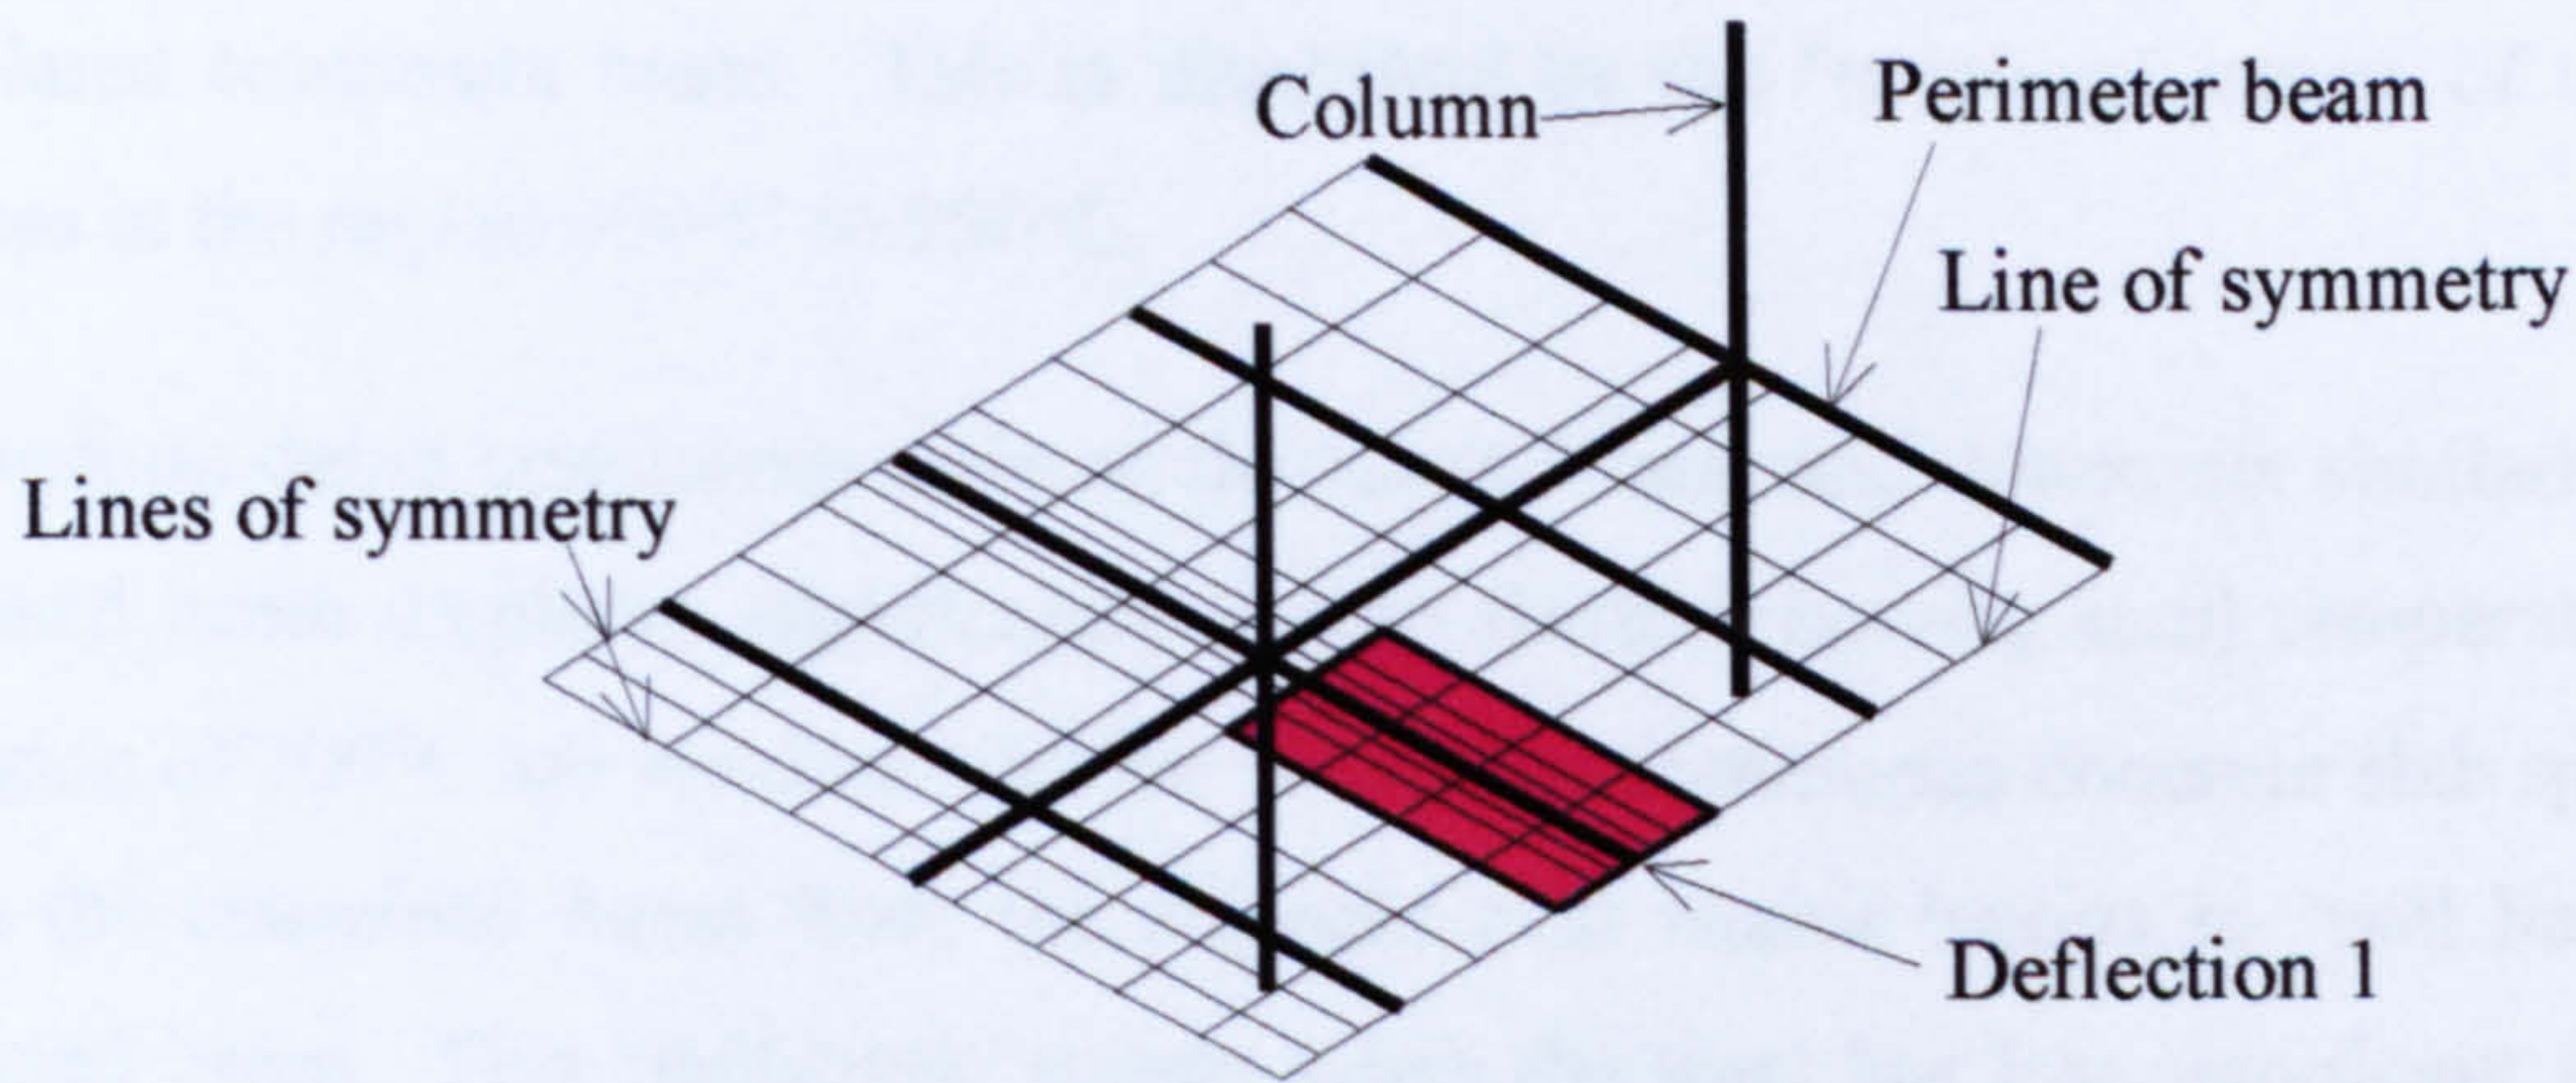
Restrained beam test subframe finite element mesh arrangement
